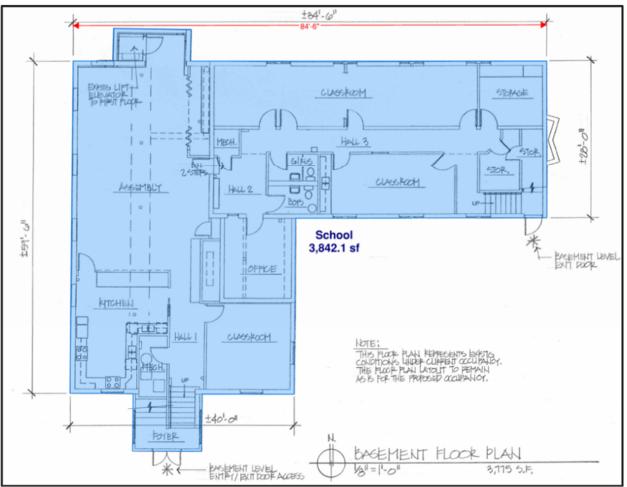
371 E. La Bonte Street Basement Level School Footprint
